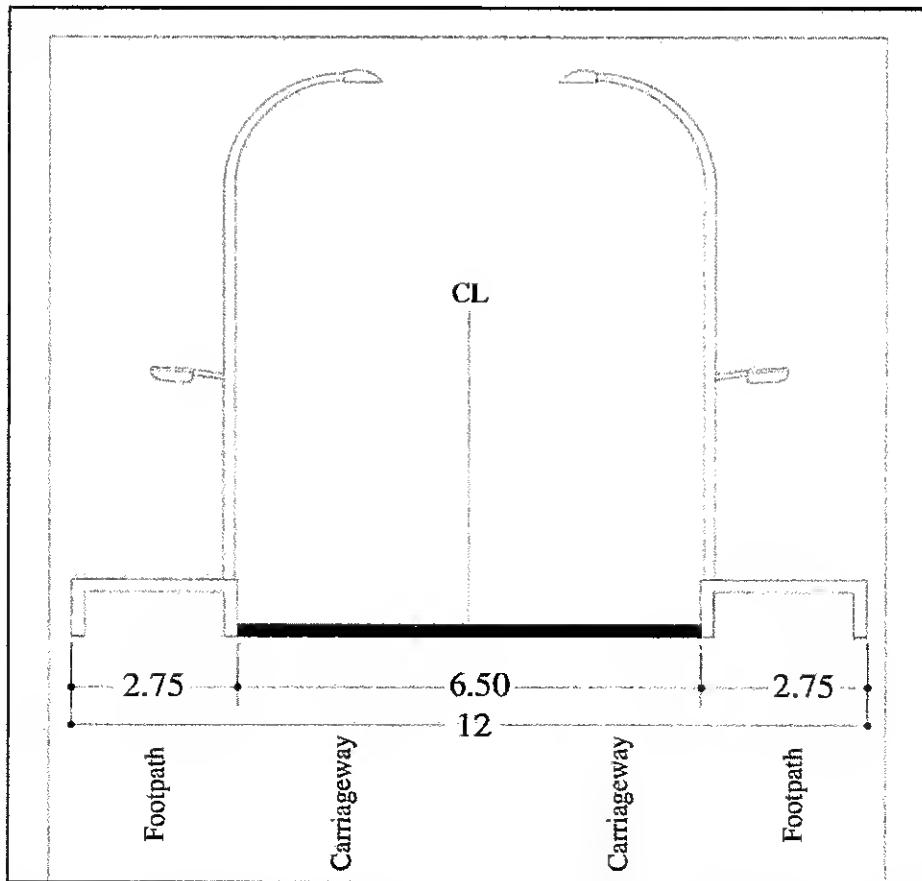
Typical Cross Section for Local Streets- Plain/Rolling Terrain
